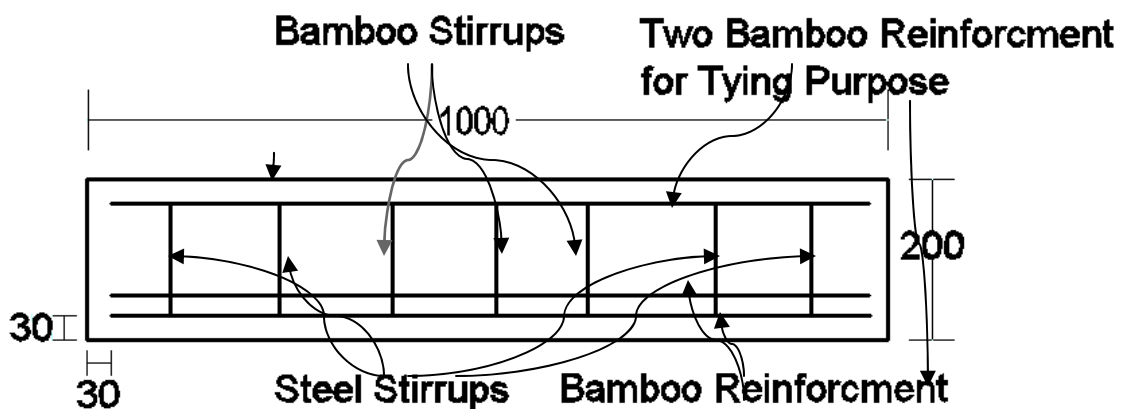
Beam Dimension and the Position of Steel and Bamboo Stirrups
